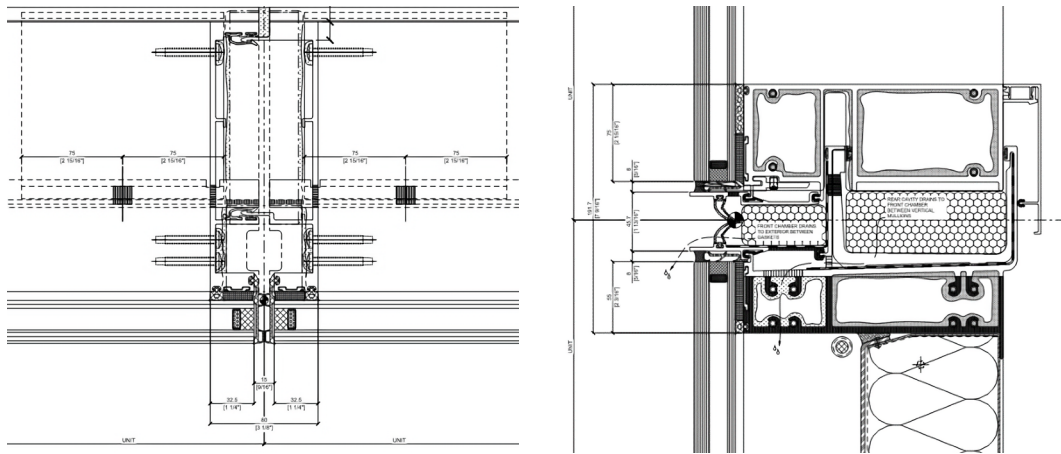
Typical KoP façade details. Left – Typical mullion, Right – Typical Stack Joint.
